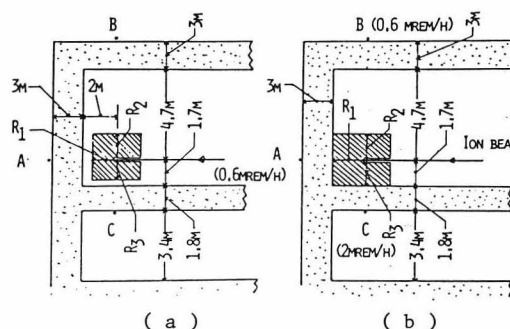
Longitudinal sectional views of a typical experimental hall. These are illustrated as examples for the design of a beam dump.
